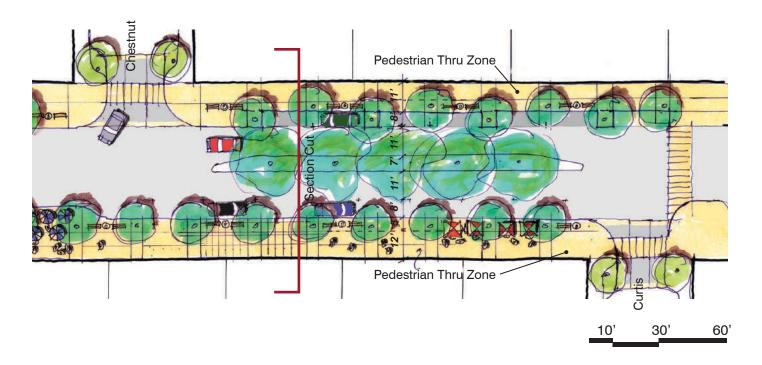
Concept Plan of Santa Cruz Avenue with Major Streetscape Improvements. This plan does not feature the Central Plaza described in the next section.
